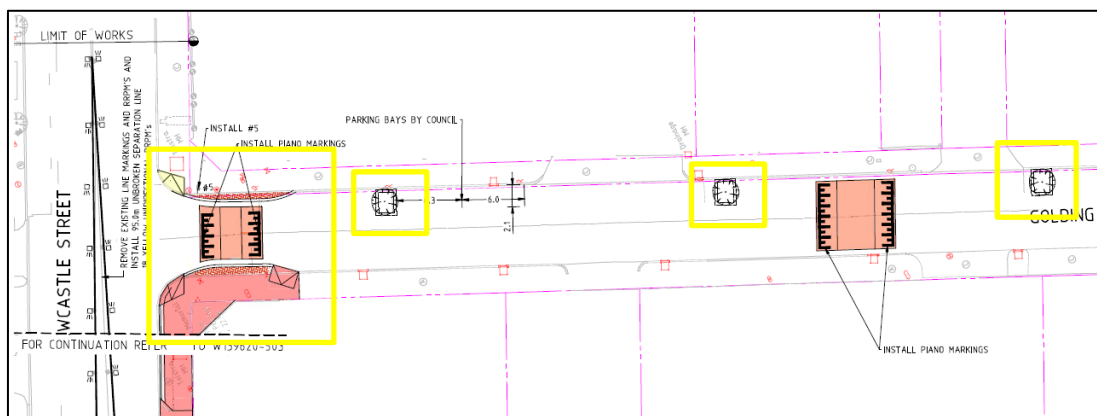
Safe Active Streets Design Extract (Golding Street and Newcastle Street intersection)
